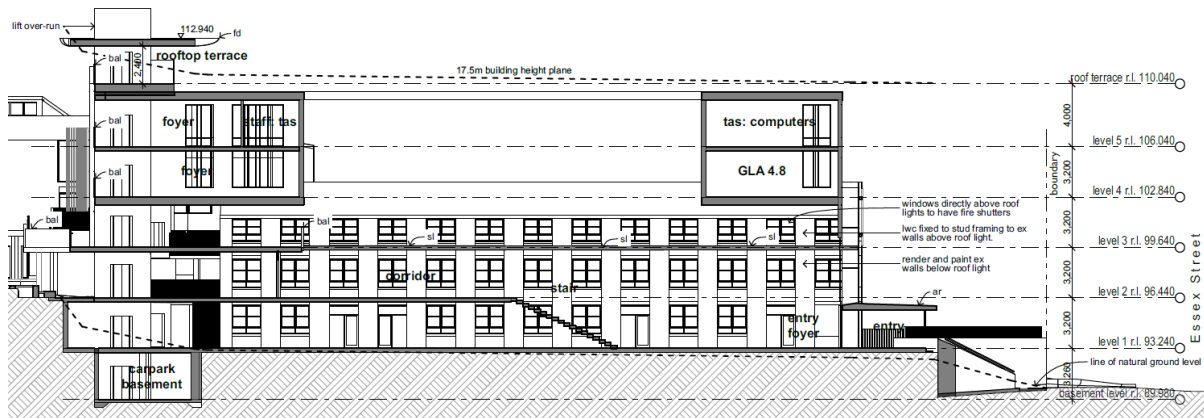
Part cross-section (DA10, Revision 03, date 30 June 2017) through existing Essex Street building, lift core 2 overrun and the new Essex Street stairs and ramp. Source: Stanton Dahl Architects
